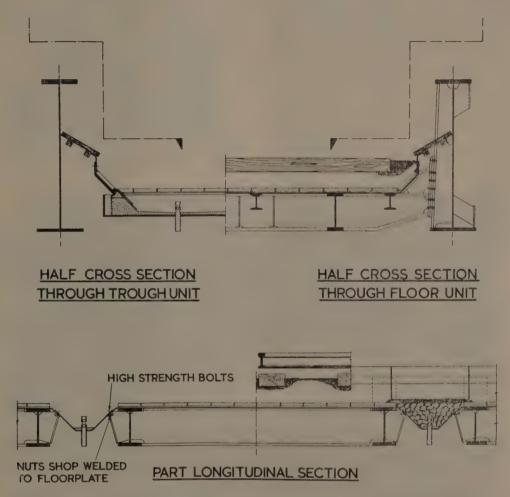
The design of floor for half through type plate girder spans standardised on the Western Region of British Railways.
